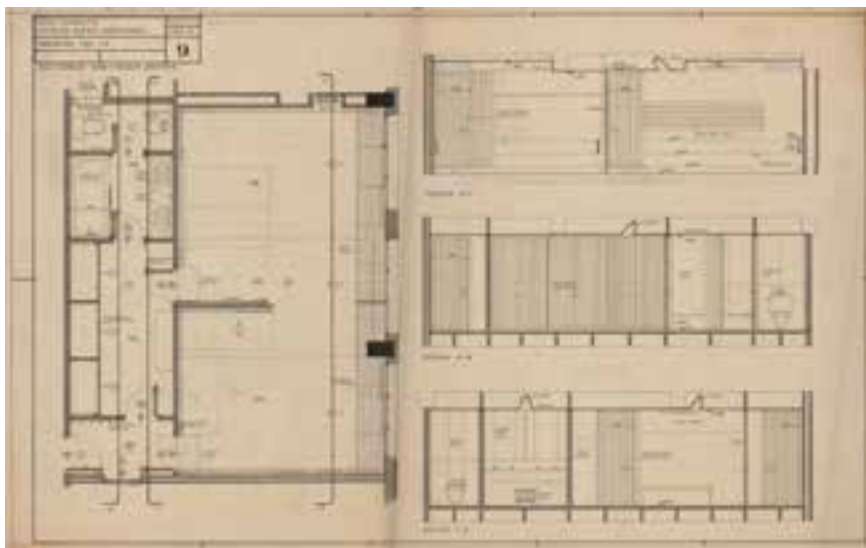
José Antonio Corrales and Ramón Vázquez Molezún, Hotel Formentor, Majorca, Spain, 1963. Plan and sections of a suite. © Fondo Ramón Vázquez Molezún. Servicio Histórico Fundación Arquitectura COAM.
